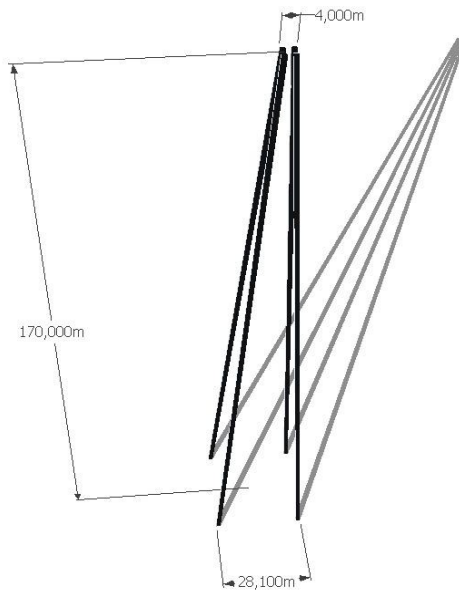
Truss tower geometry. Top width 4 meters, bottom width 28.1 meters, and height 170 meters.
